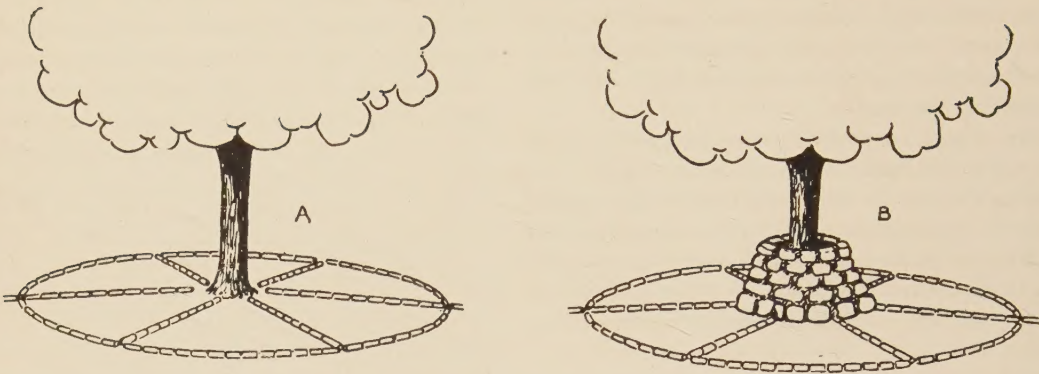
A, horizontal field tile. B, construction of dry well.
